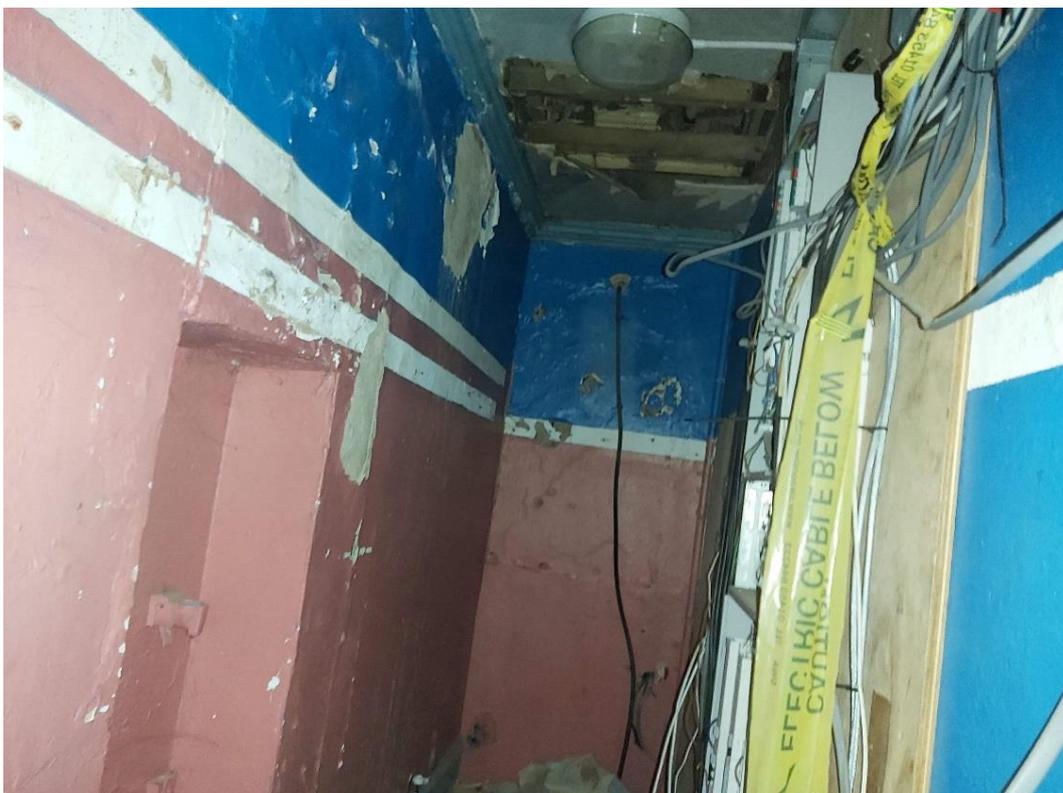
Main Hall / Stairwell Electrical Room Ceiling & Plaster Damage
